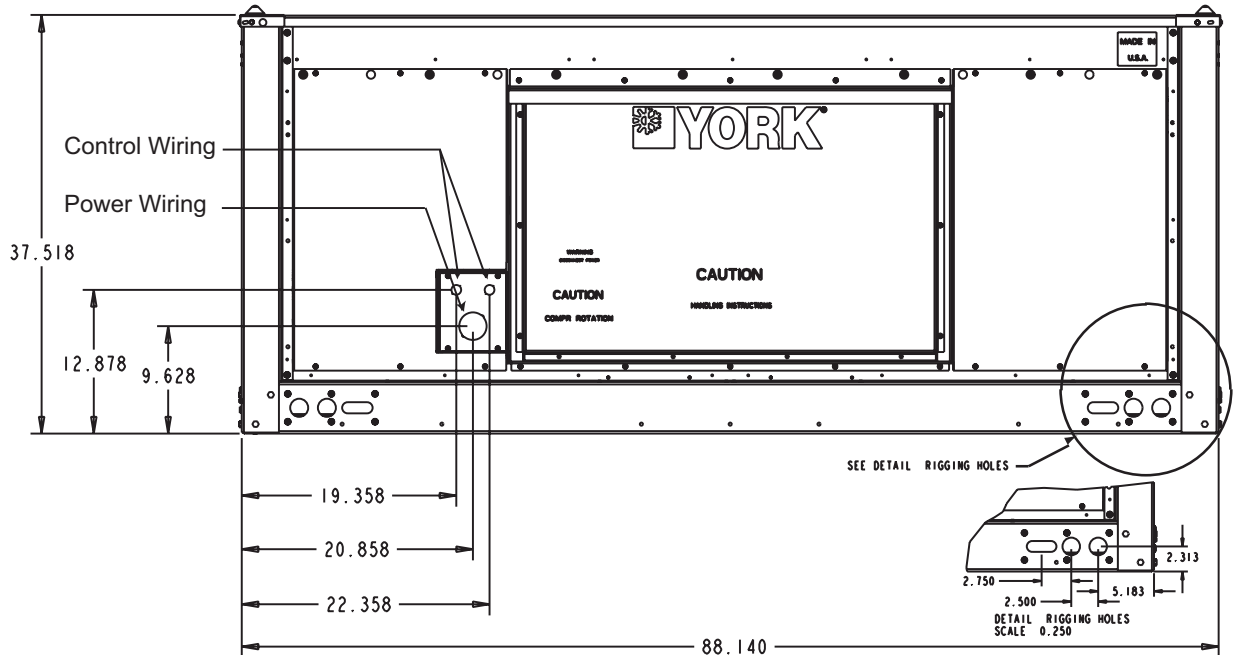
25, 30 & 40 TON POWER AND CONTROL WIRING CONNECTIONS
